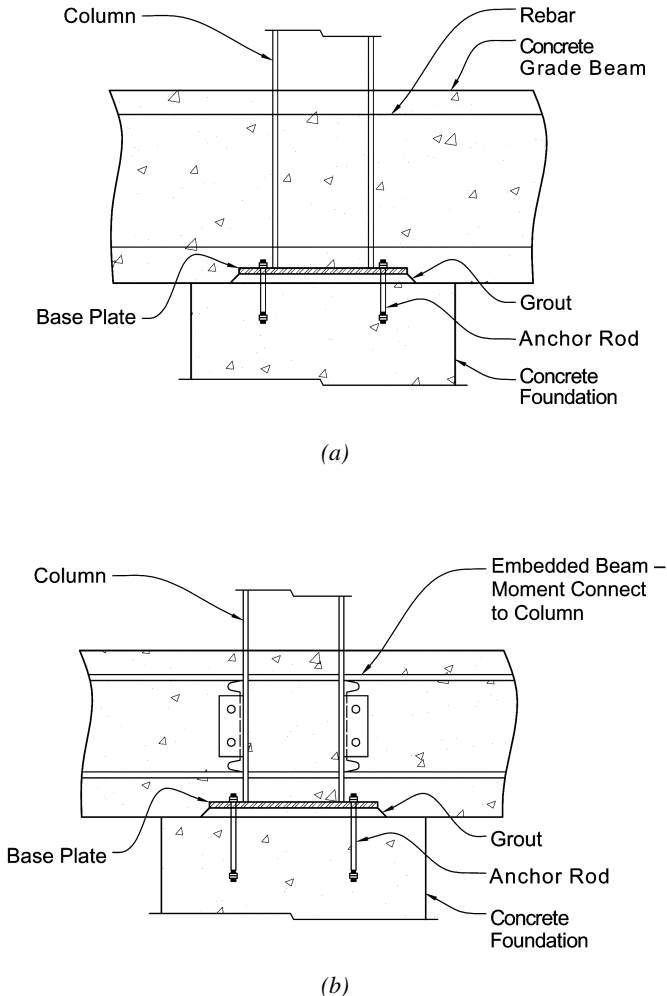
Examples of column base fixity in a grade beam.
